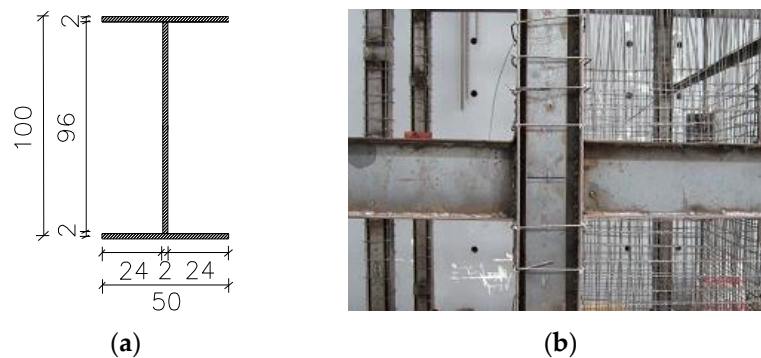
(a) Beam cross-section; (b) beam-column connection (unit: mm).
